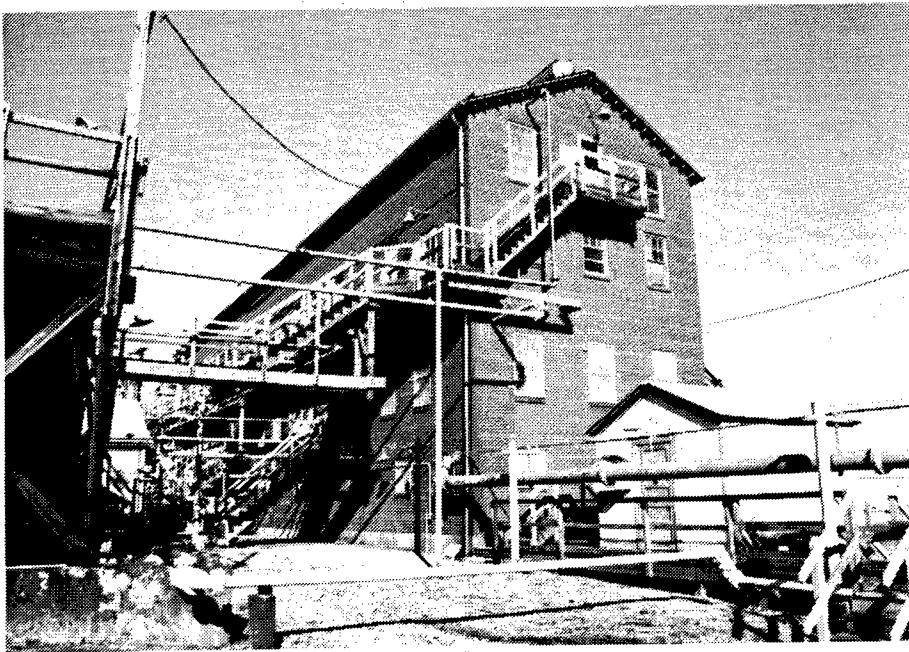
Building 1012: Nitrating House that is four stories and constructed of brick.
